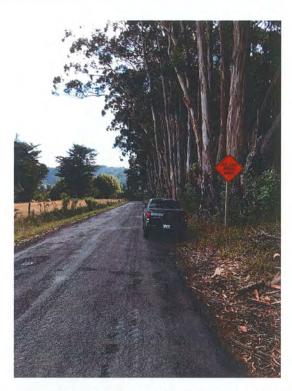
RP 3. Typical section of Chambers Rd (County maintained. State Road No.: FC010). Vehicle traveling east, photo taken facing east. "ONE LANE BRIDGE AHEAD" sign visible to eastbound traffic.
